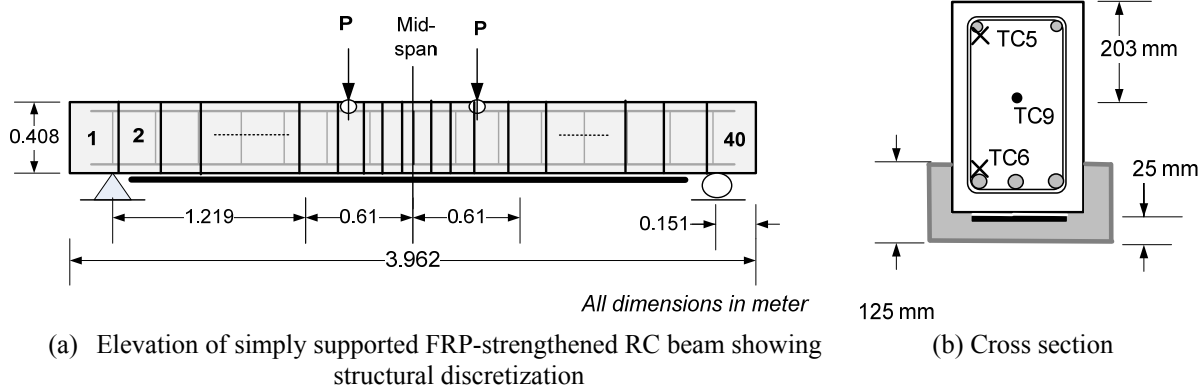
Elevation and cross sectional details of MSU tested FRP-strengthened RC beam
